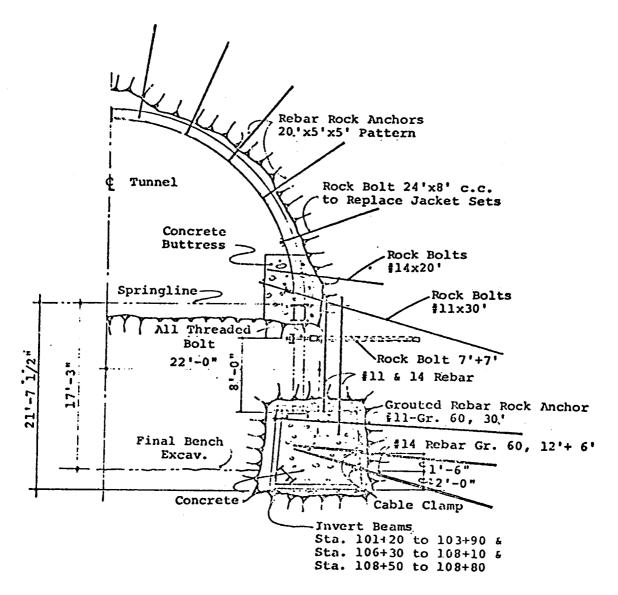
Zone III Rock Reinforcement and Support Sta. 100+30 to Sta. 109+07.
